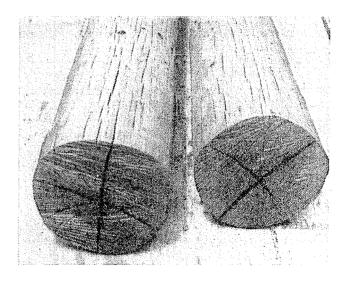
Controlled checking and splitting in boultonized karri pole sections.
